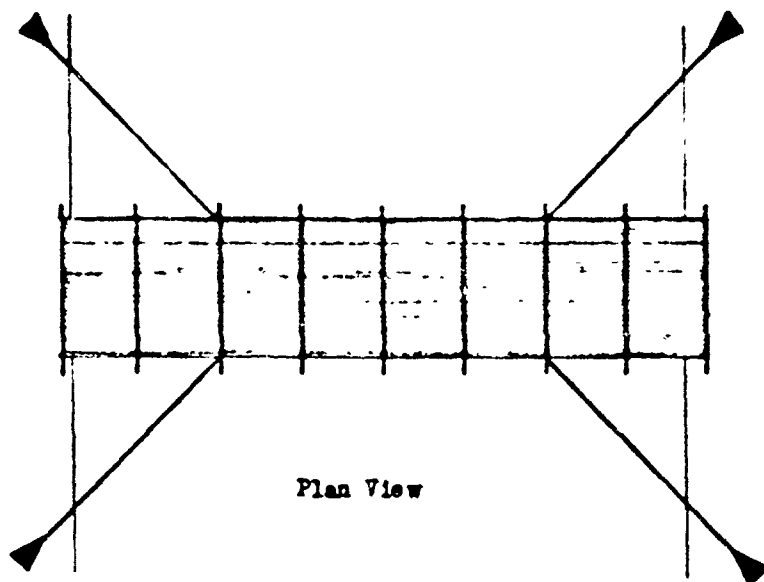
Bailey Bridge Showing Attachment of Anchor Cables
